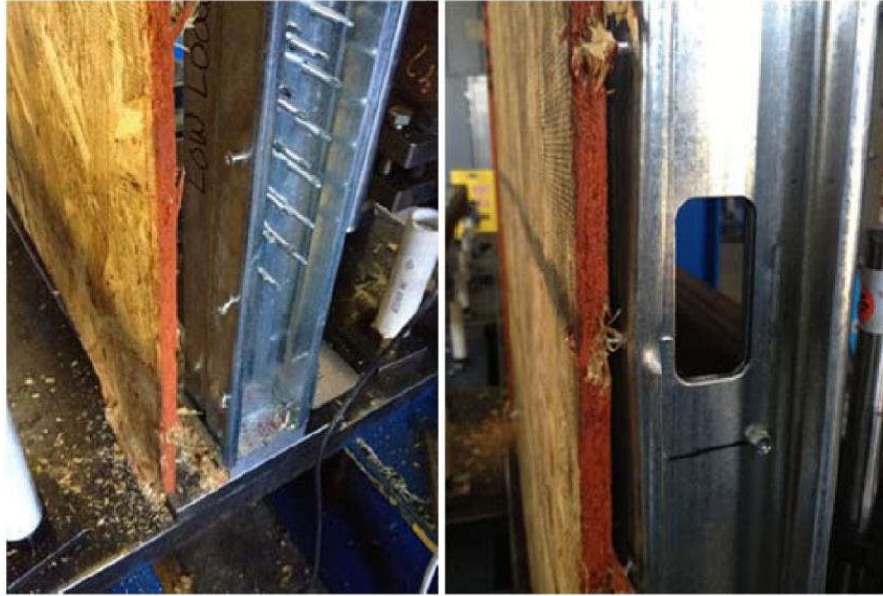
Typical failure modes of the sheathing-to-framing screw fasteners in wood-sheathed CFS-SWP: a) pull through and b) tear out-bearing [11].
